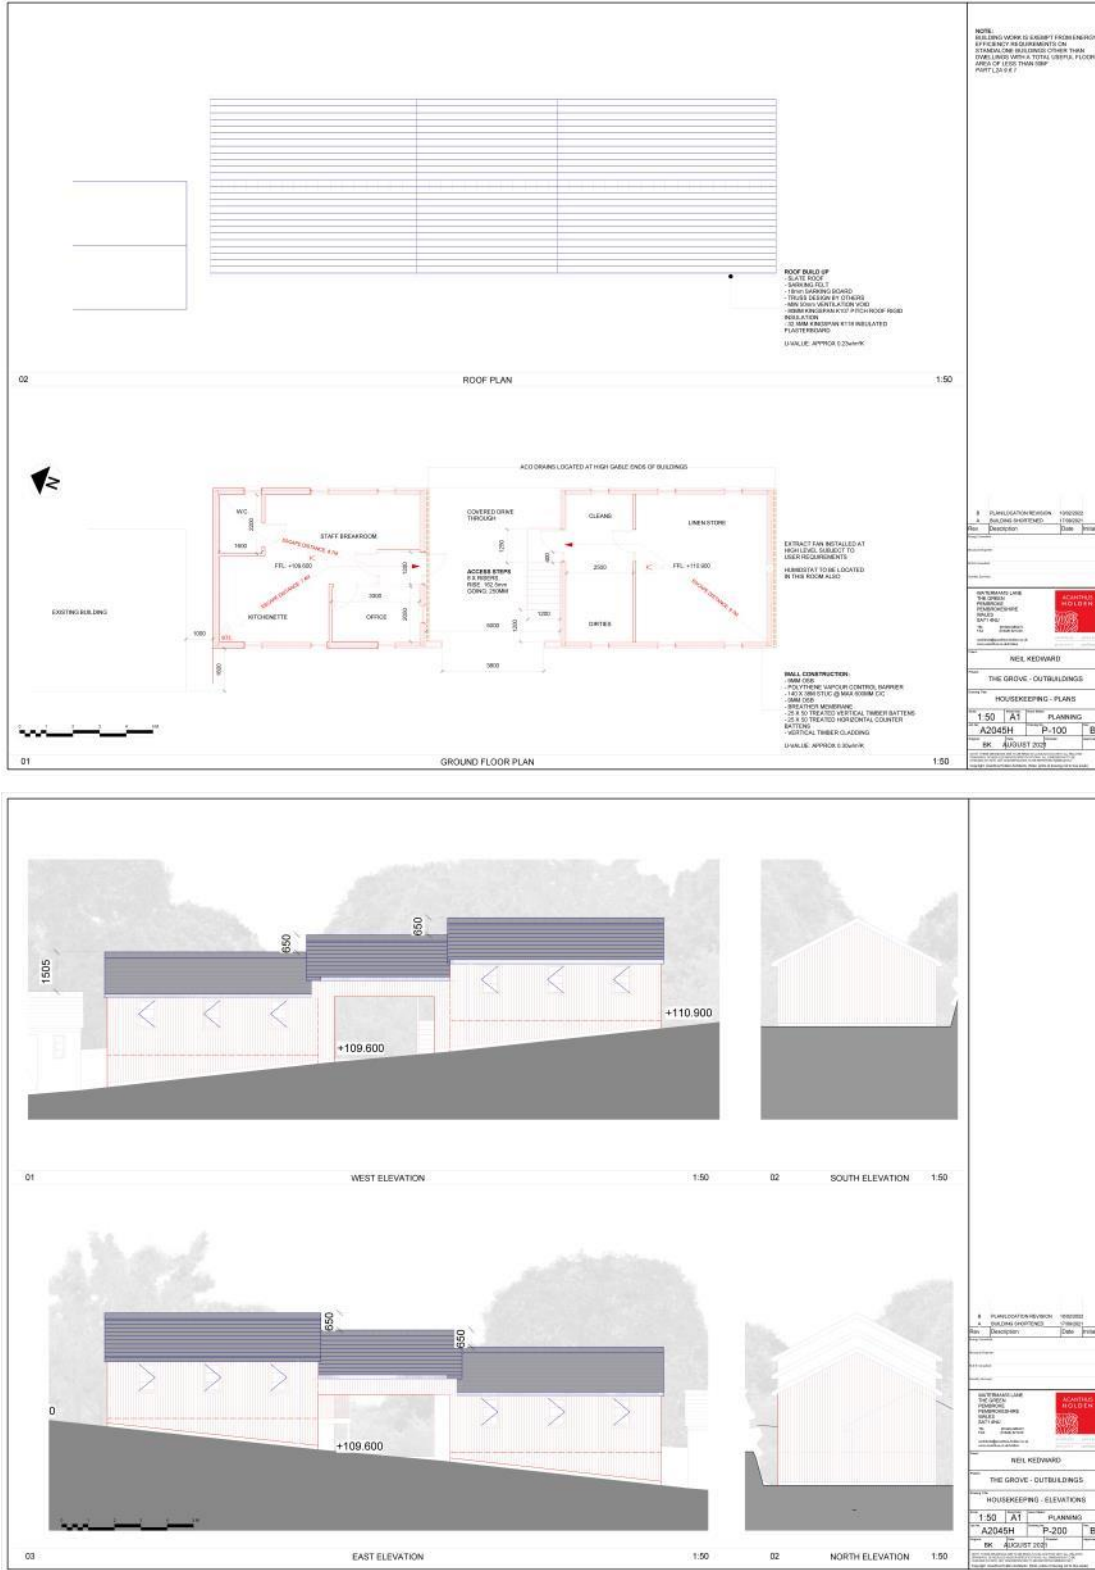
Plans and elevations of the housekeepers building. Plans provided by the client as part of the planning application (21/0617/PA), not reproduced to scale
